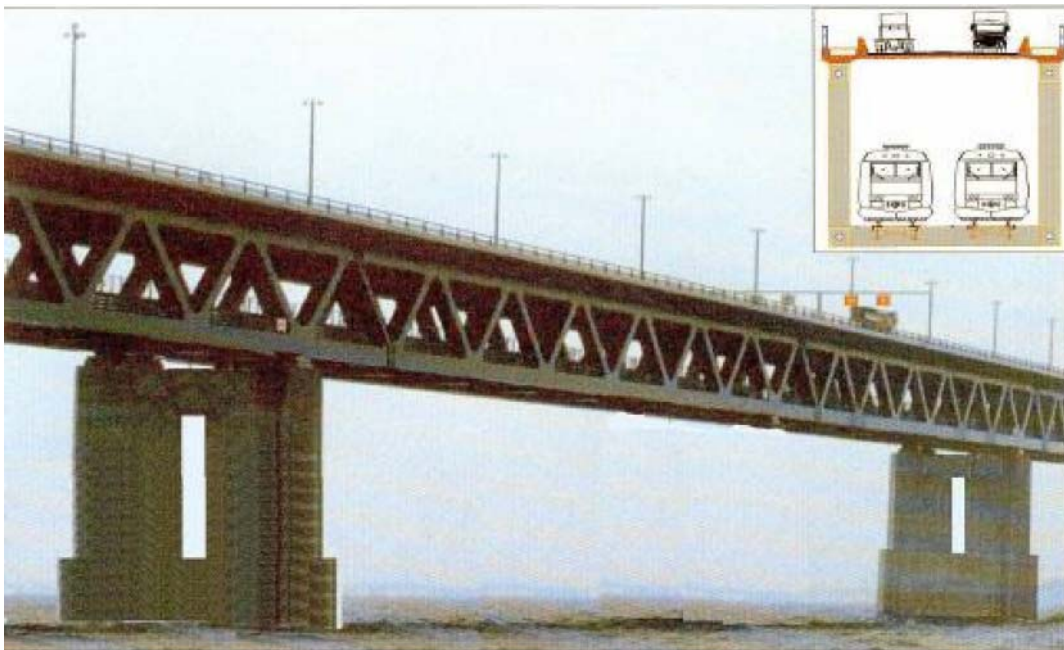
Proposed bridge at Bogibeel with 125m span (A. K. Goyal, 2013)
